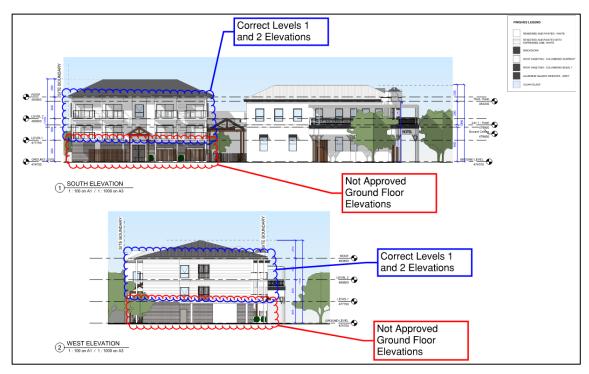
Southern and Western Elevations – Correct Level 1 and 2 Elevations (Amended by Council 19 August 2024)
